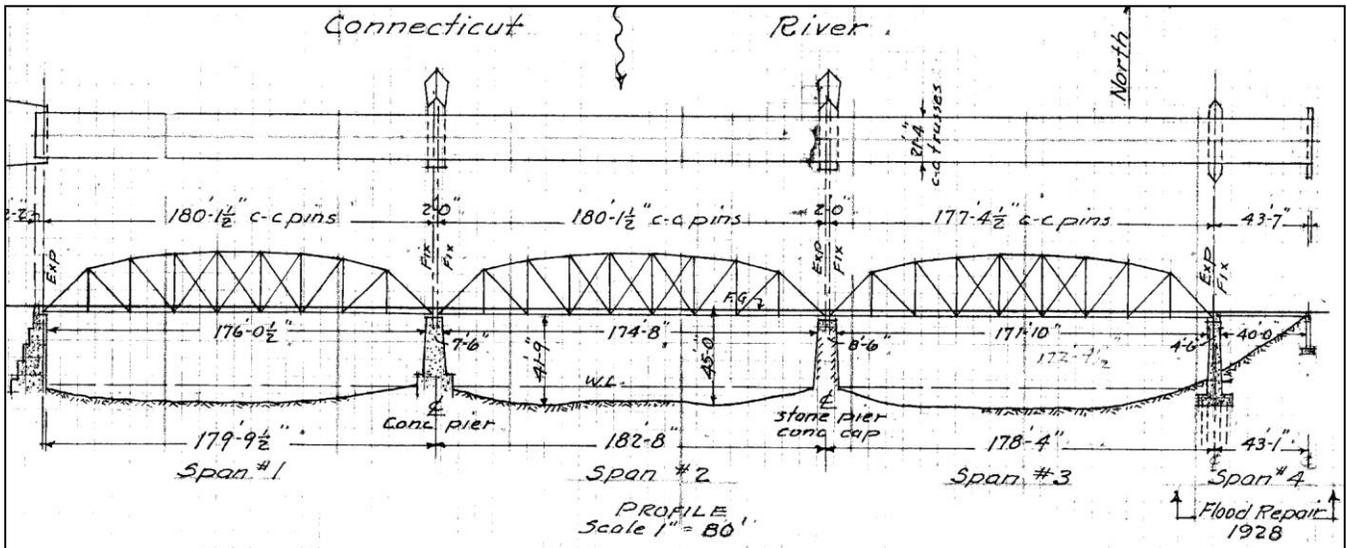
Claremont 065/137, "Ascutney Bridge" over Connecticut River between Claremont NH and Weathersfield VT. A 3-span pin-connected Parker truss designed by John Storrs, built by United Construction Company in 1908. Replaced in 1969. Plan & elevation sketch. (NHHD Bridge Inventory Card).
